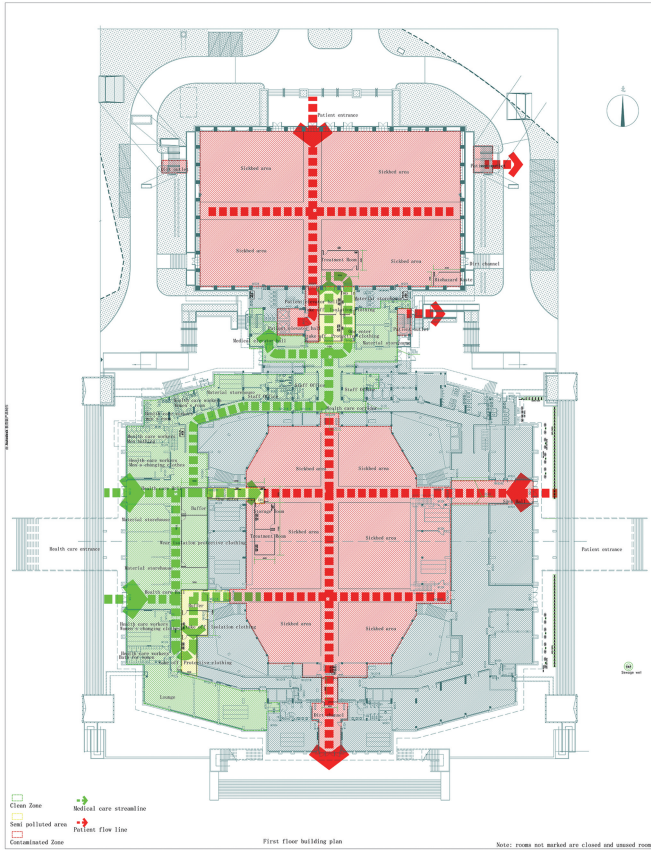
Plan of Wuchang Fangcang Shelter Hospital Floor 1
